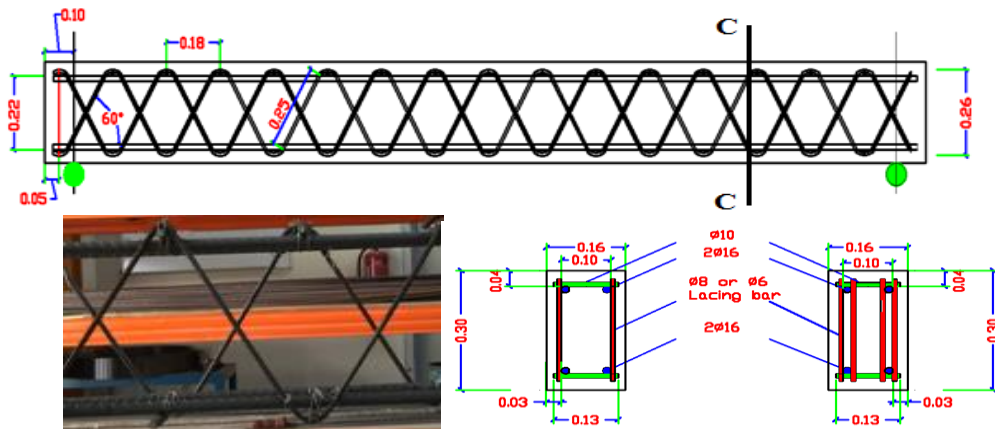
LRC Beams with angle 60° lacing inclination to horizontal.
